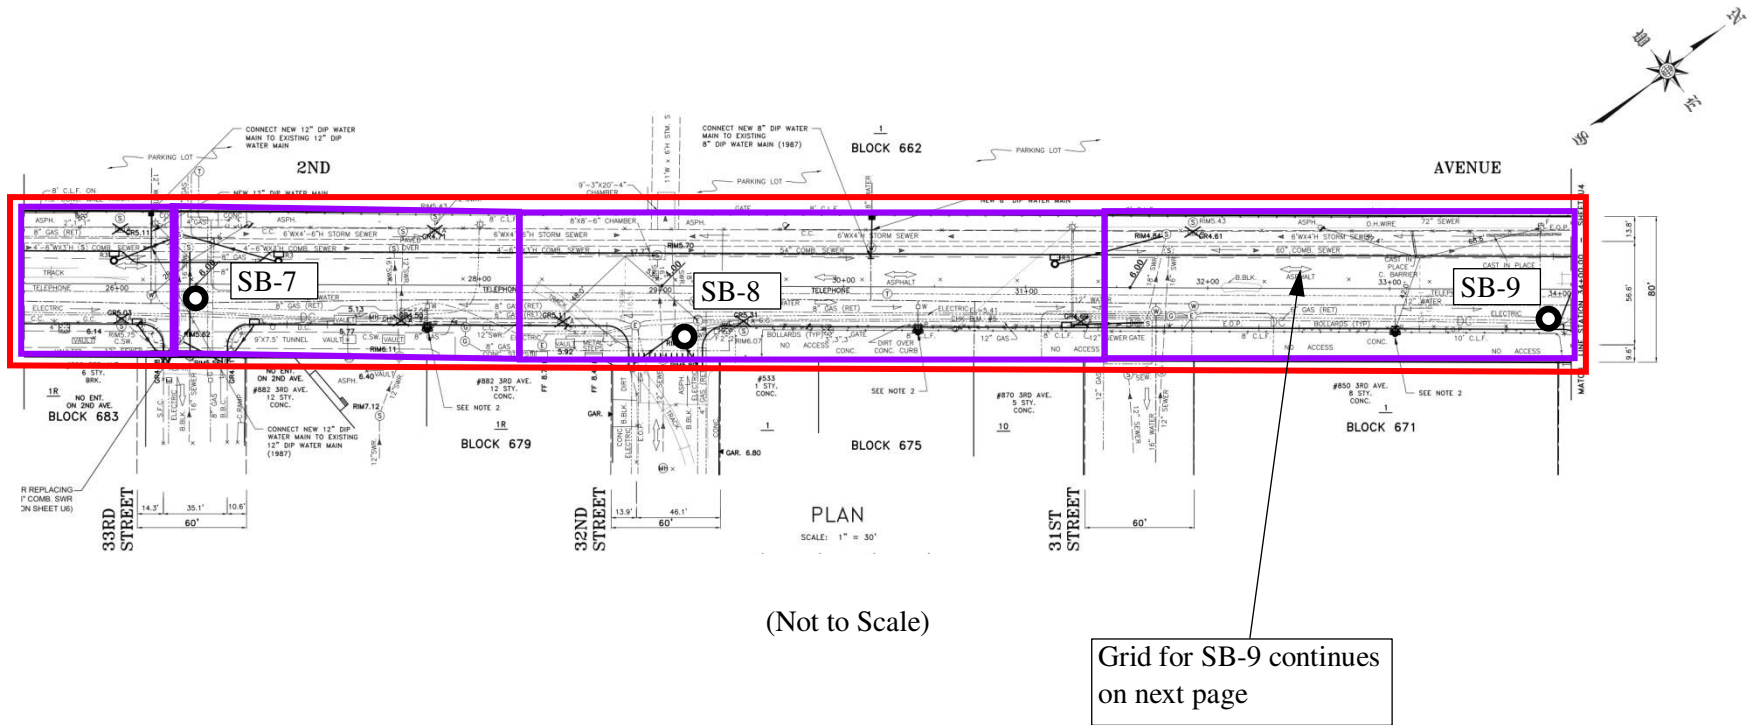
Soil Boring, Sample and Grid Location Plan
